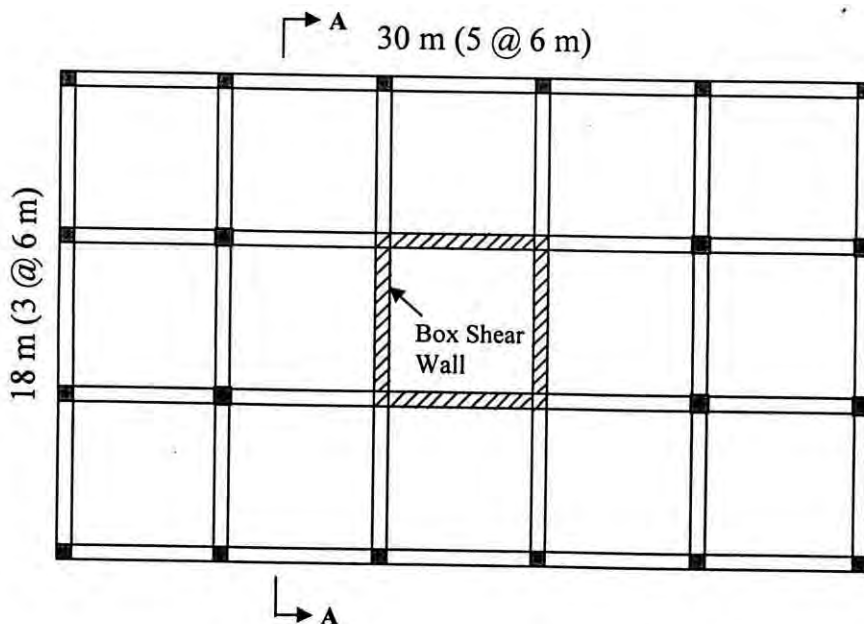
Plan of Selected Frame Structure with Box Shear Wall.
